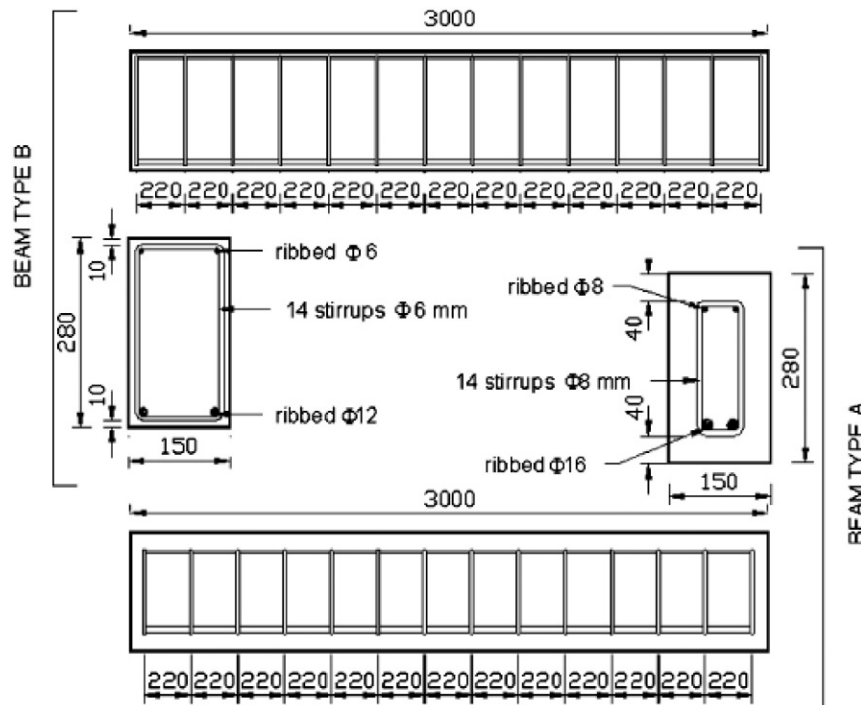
Layout of reinforced concrete beams types A and B (all dimension are in mm).
